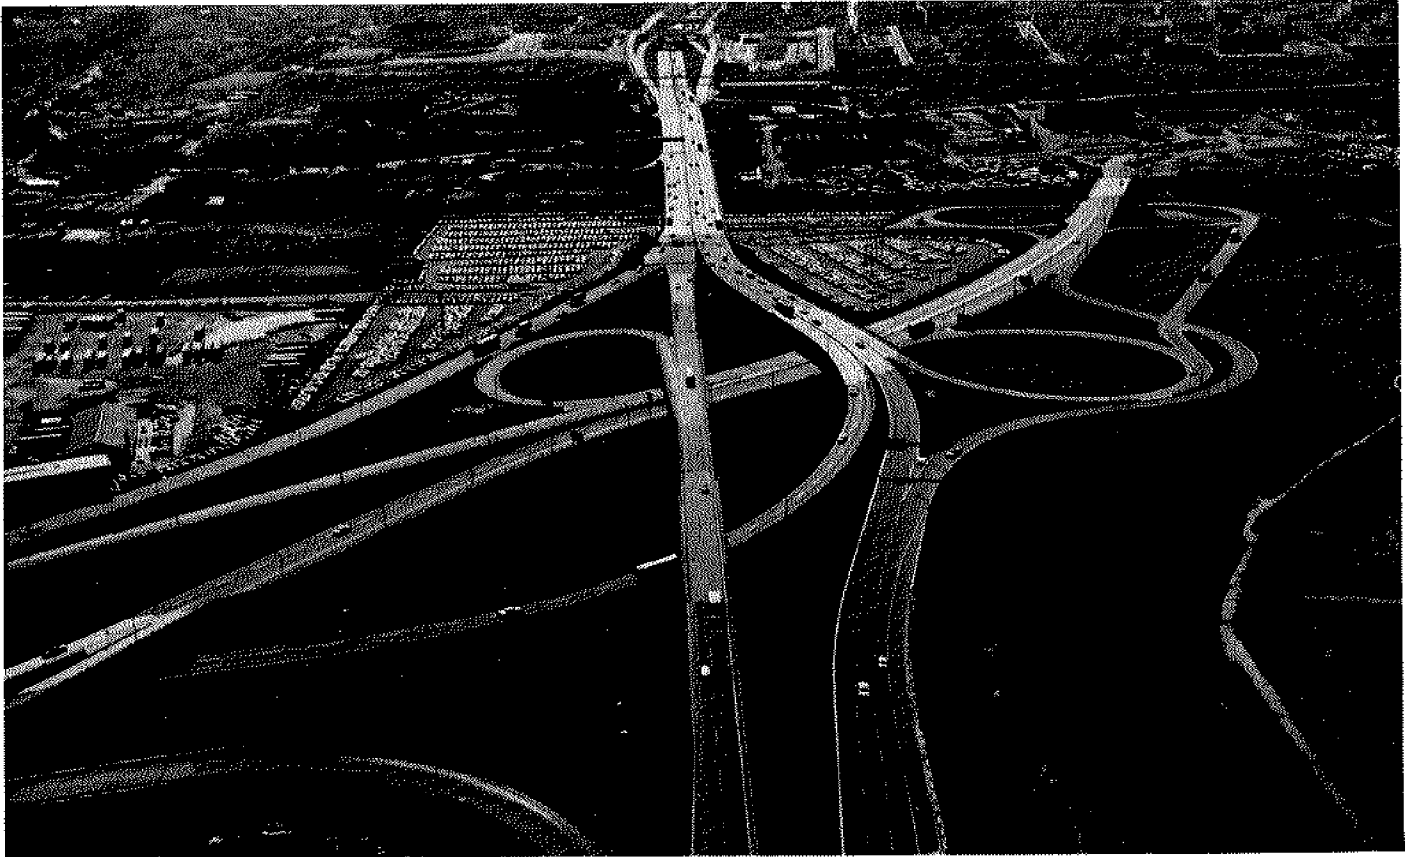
New Jersey Turnpike approach to Lincoln Tunnel (Courtesy of Port Authority of New York and New Jersey)
